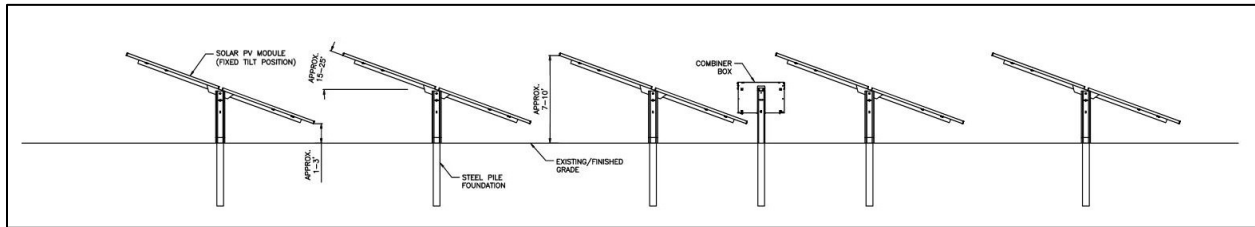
Horizontal Fixed-Tilt Racking Solar PV Typical Elevation View
